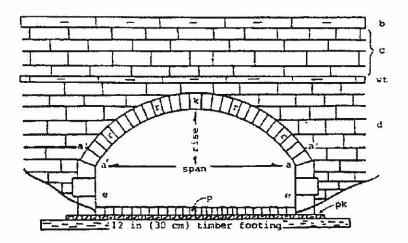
Profile of a Culvert or Aqueduct. A-a' skewback, b coping, c parapet, d spandrels, e abutment, k keystone, p pavement, pk 3 inch (7.5 cm) plans, r ringstones (archstones), wt water table or belt.
